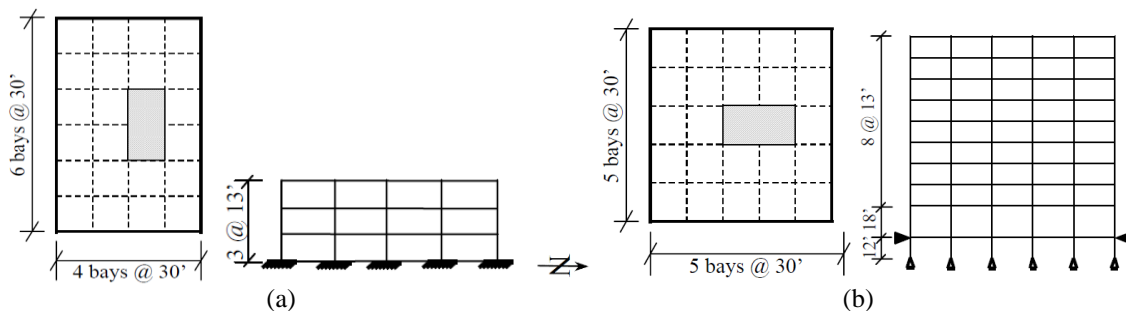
Floor Plans and Elevations for (a) 3 & (b) 9 storied SAC SE buildings.
